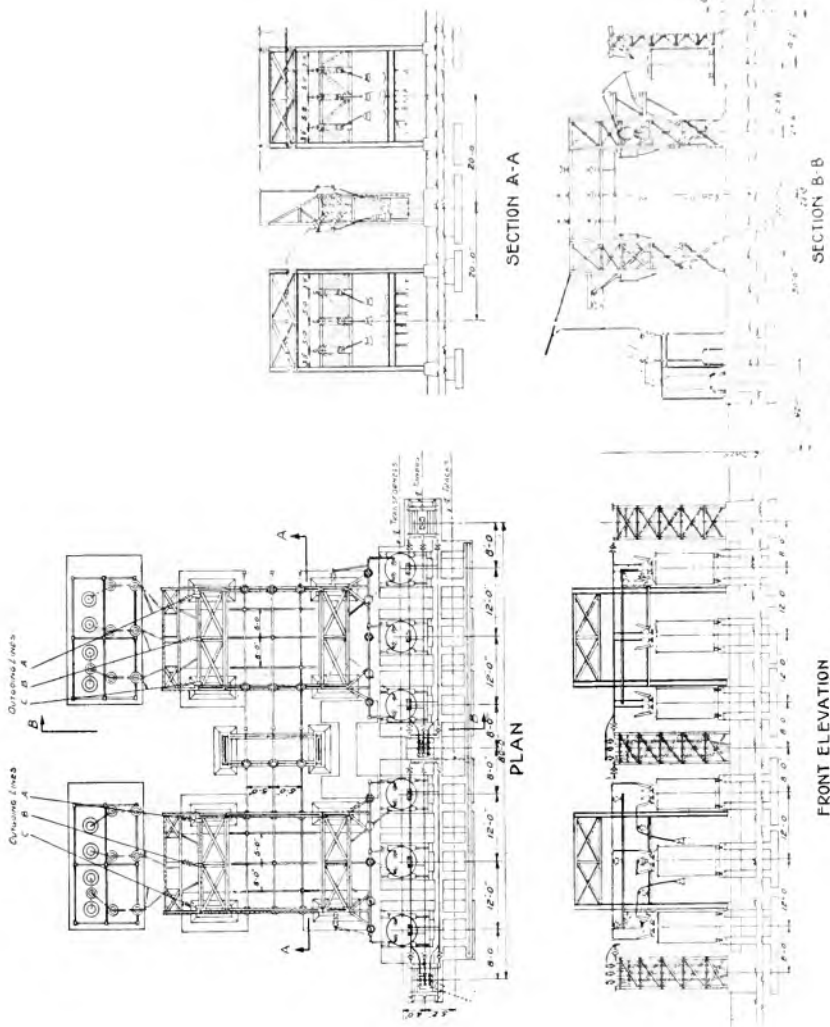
Arrangement of Outdoor Substation: Hampden Station
